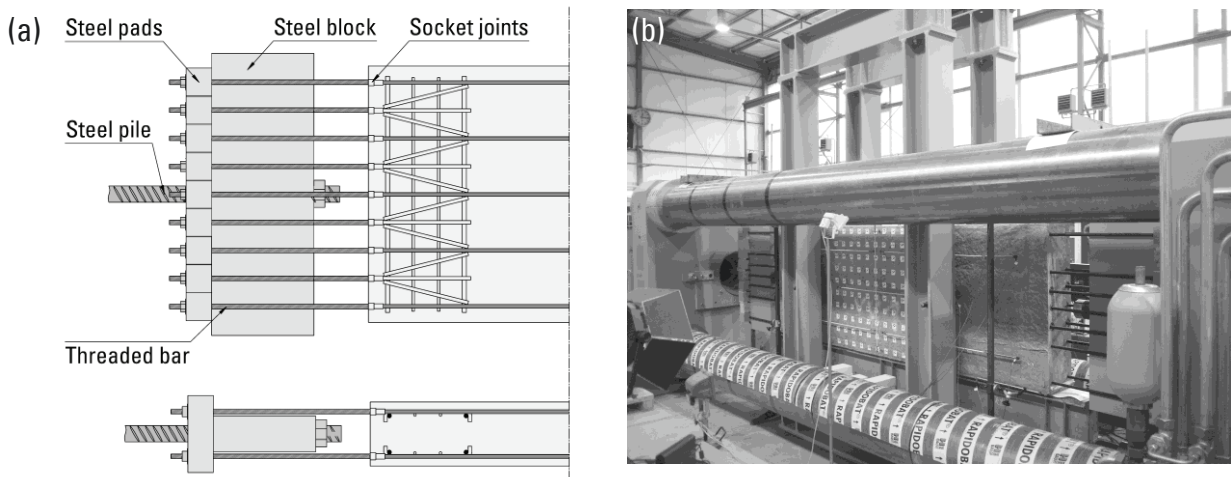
(a) Schematic view of the load introduction setup and (b) the completed test setup with a R/SHCC slab and measurement equipment
